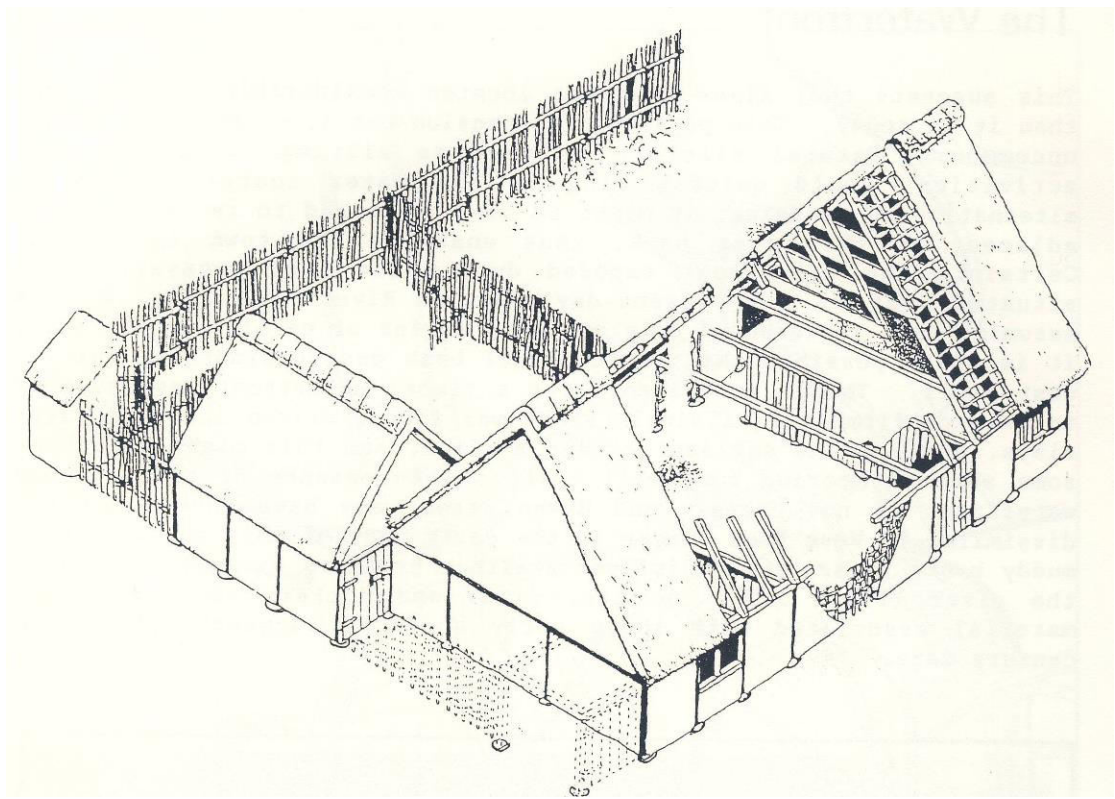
Reconstruction drawing of padstone building on Blackfriargate site in Hull.
